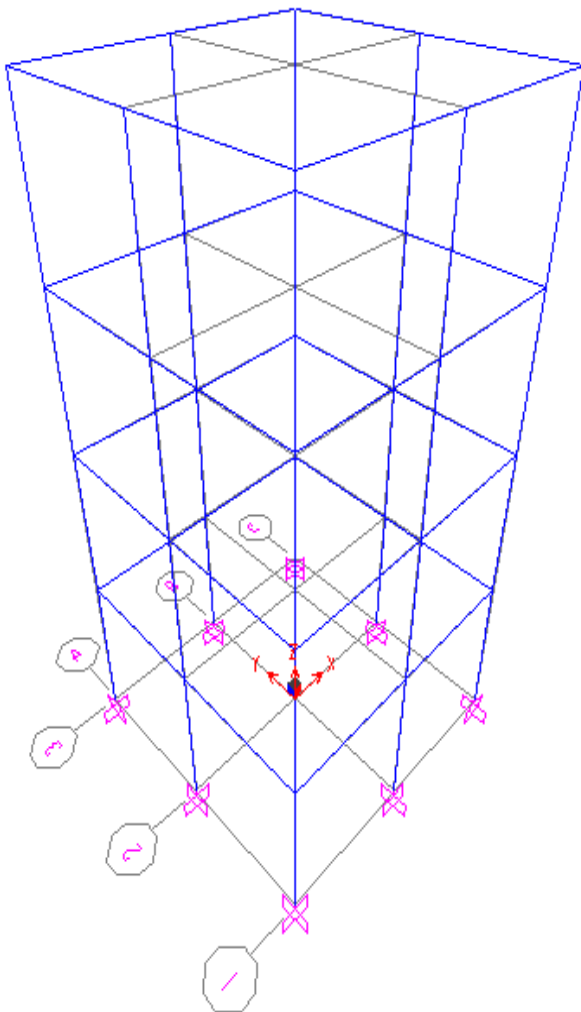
Sap model Water Tank 8 column (Rectangular)
